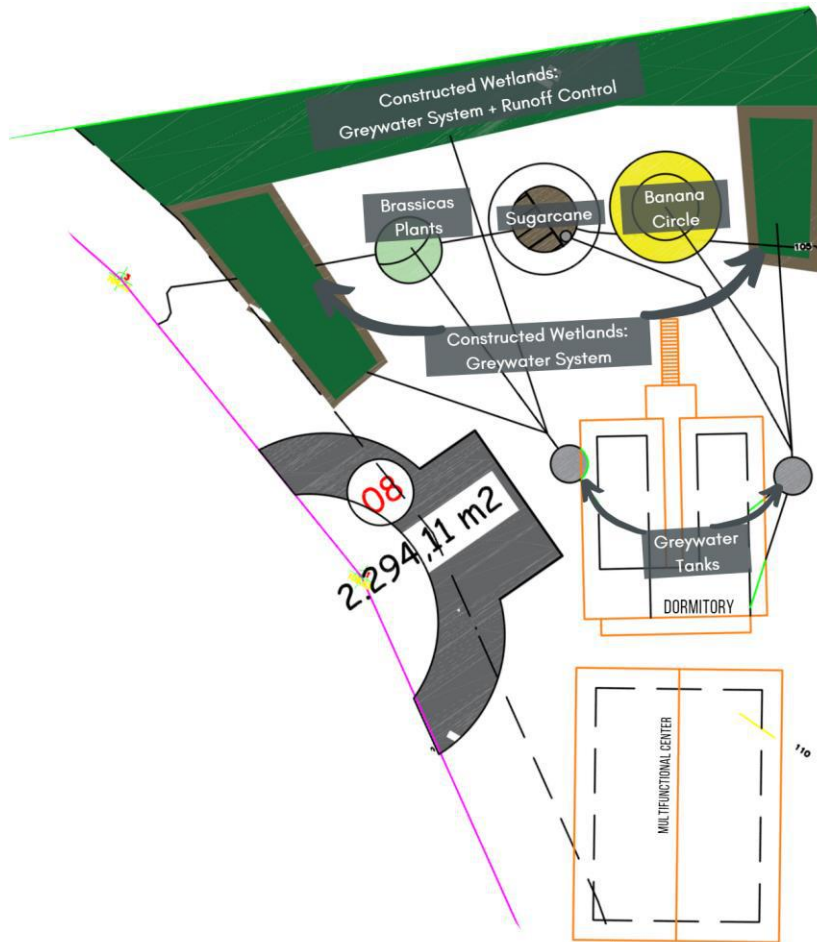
Site Layout design. More detail can be found in Structural and Energy System Design and Analysis in Bahia, Brazil supplement.
